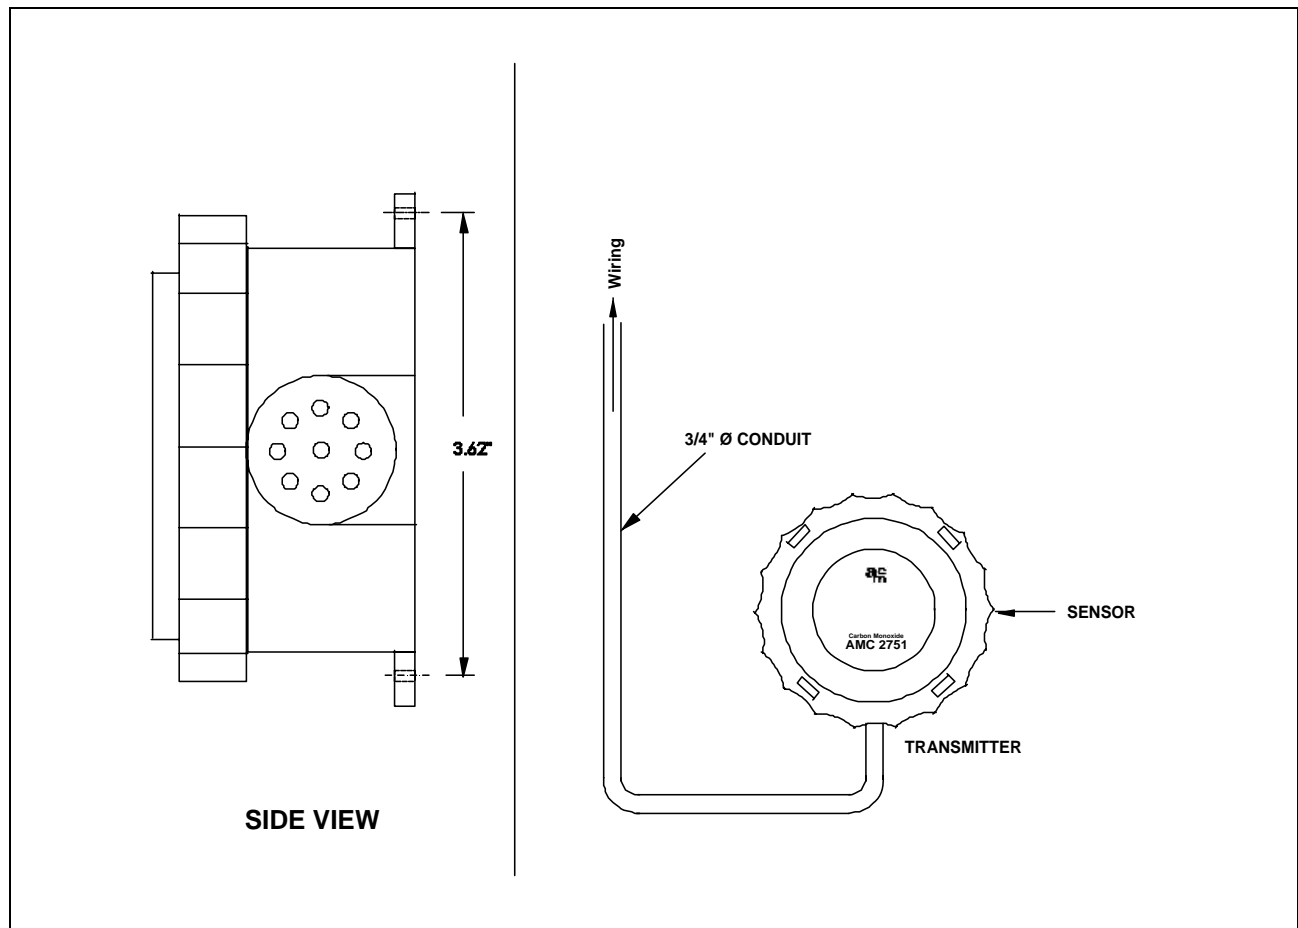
Mounting of AMC-2751 Sensor/Transmitter Unit
